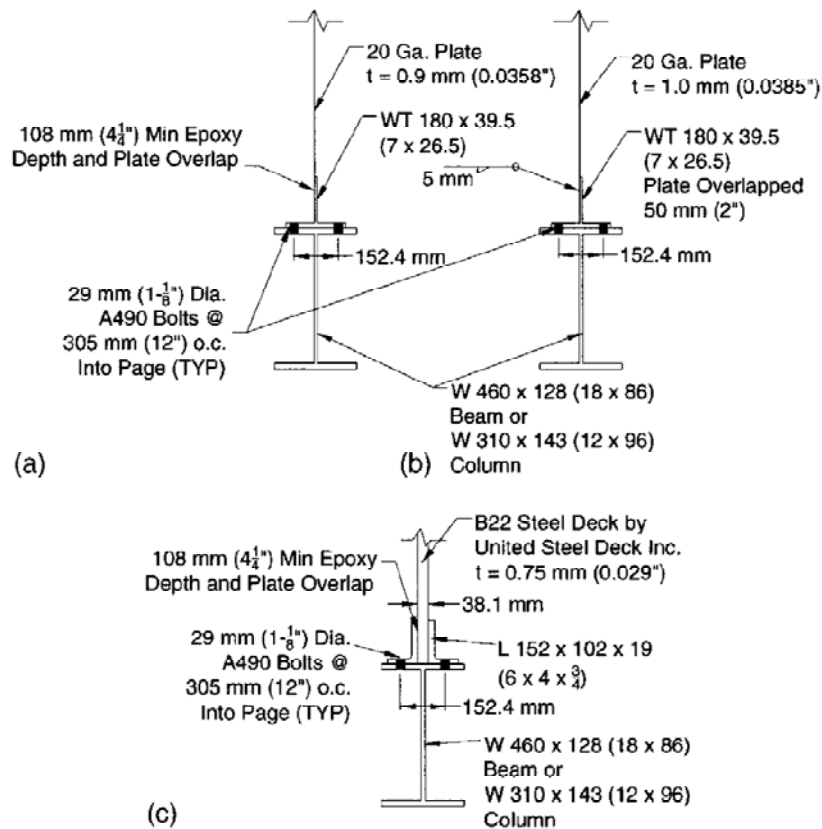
Infill Panel-to-Boundary Frame Connections (a) Specimen F1; (b) Specimen F2; (c) Specimen C1 (Berman and Bruneau, 2005)
